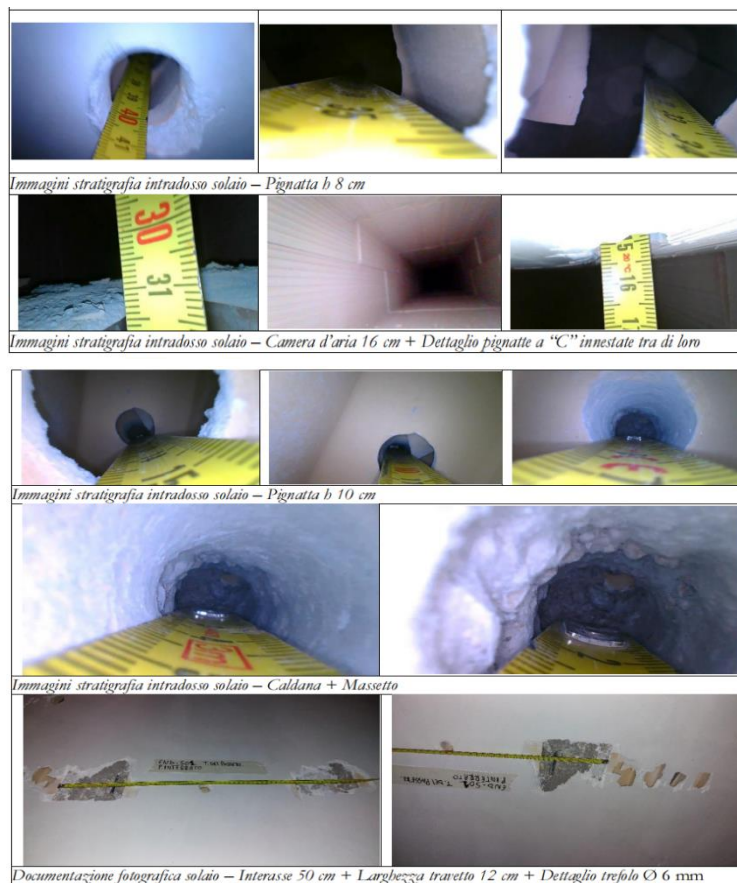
layers measurement\_Underground ceiling (END\_S\_01)
